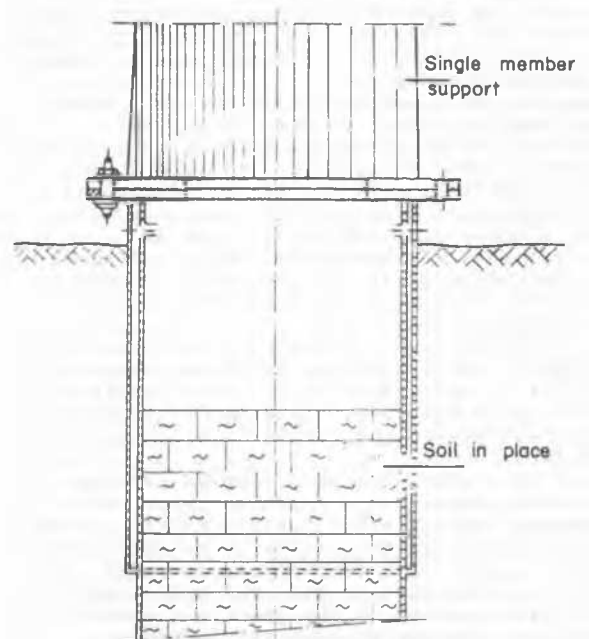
Pole foundation. Driven pier with cap. (Ref. 21)
